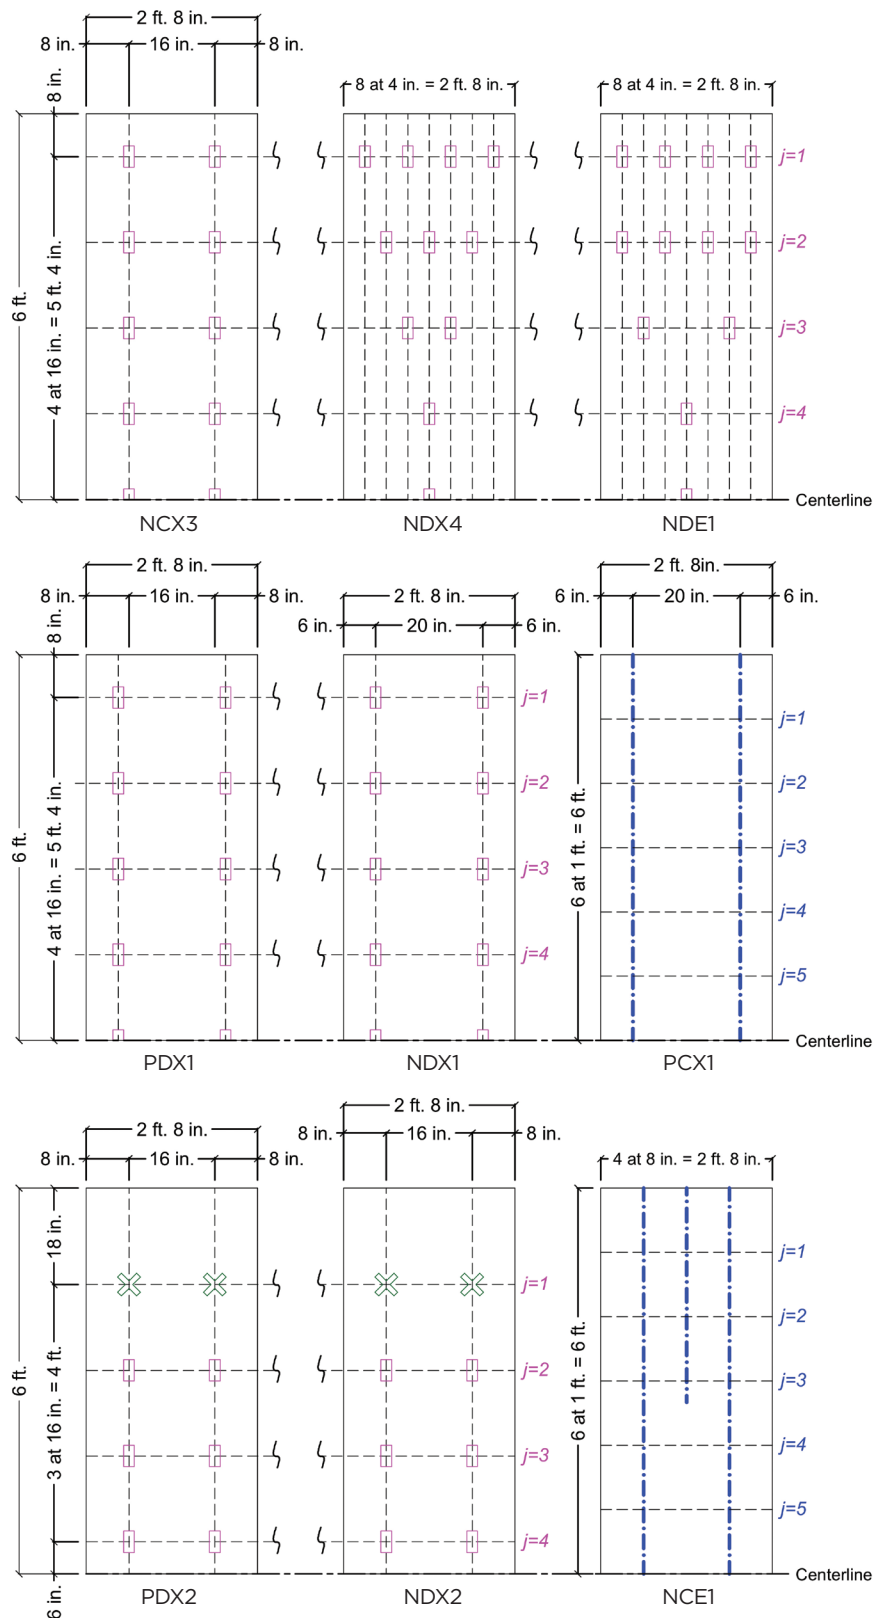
Modeled precast concrete insulated wall panel layouts. Note: Specimen panel identifications use P for prestressed and N for nonprestressed, D for discrete and C for continuous connectors, and E for EPS and X for XPS insulation. EPS = expanded polystyrene; j = row of wythe connectors from the outermost edge of the panel span increasing toward the panel midspan location; XPS = extruded polystyrene. 1 in. = 25.4 mm; 1 ft = 0.305 m.
